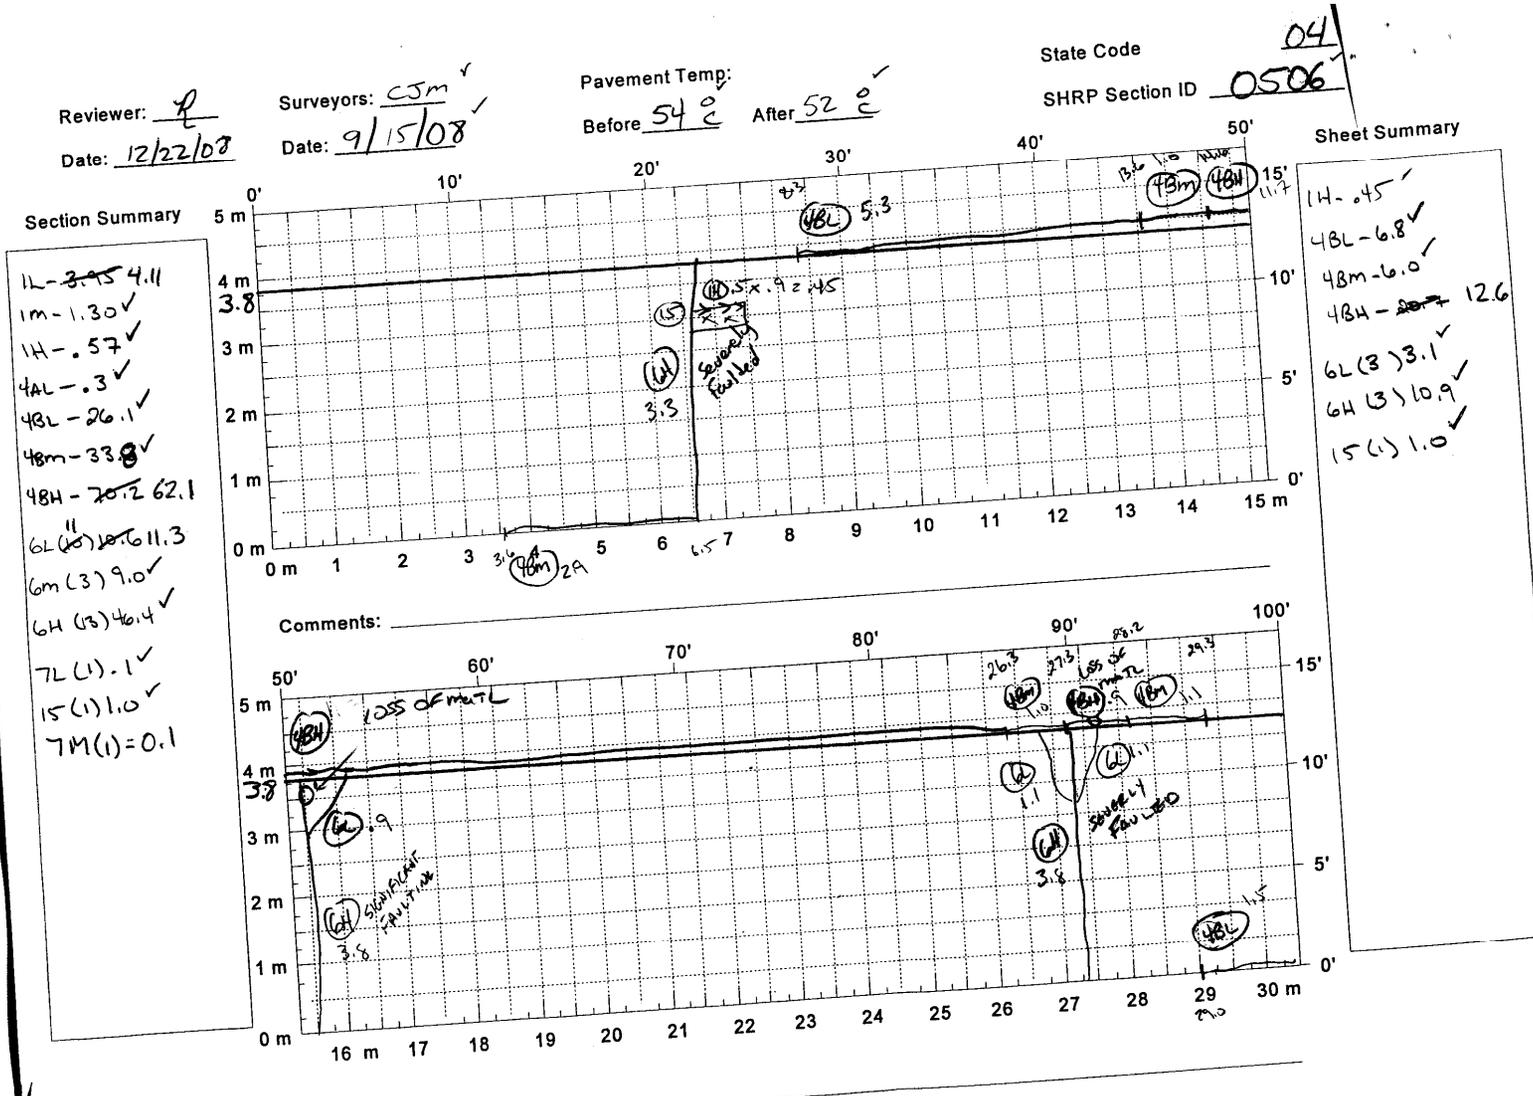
Pavement Distress Map; Station 0+00 to 1+00; Section 0506.
